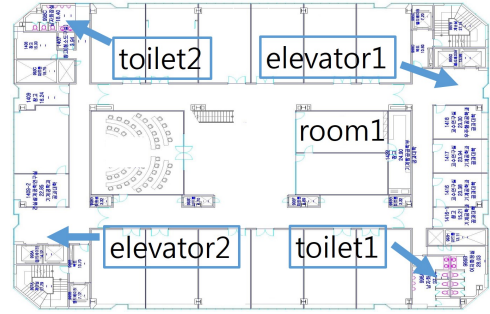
Floor plan of the 14-th floor of Bldg 301 at Seoul National University.
